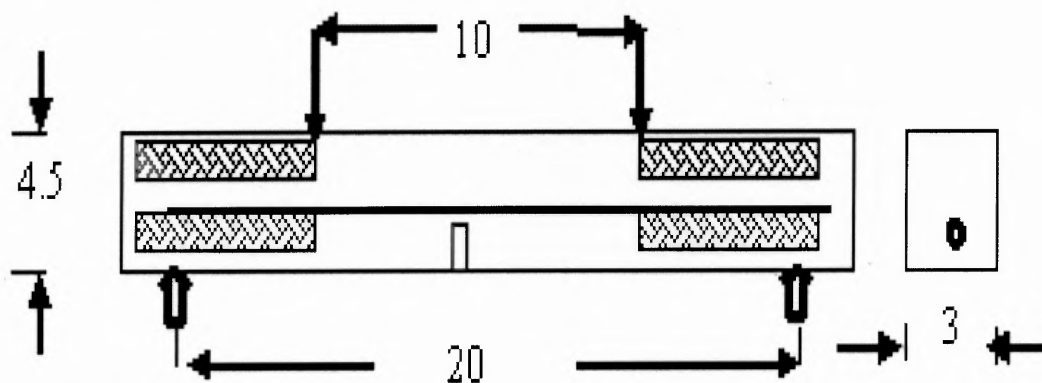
Test Setup for 4-Point Load Bending Test with CFRP Enforced on Specimen Surface. (Group I Series III).
